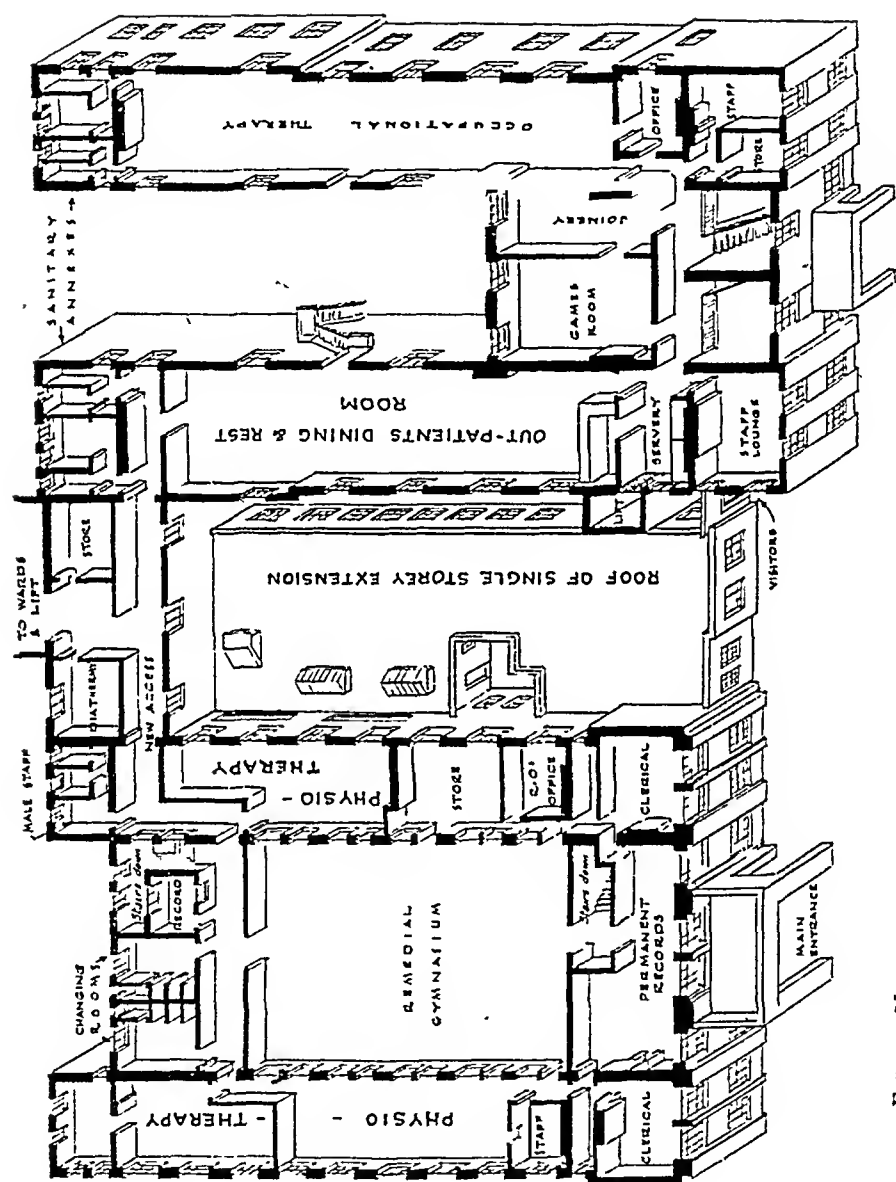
Upper or first floor view of what were two separate buildings now remodelled to form
